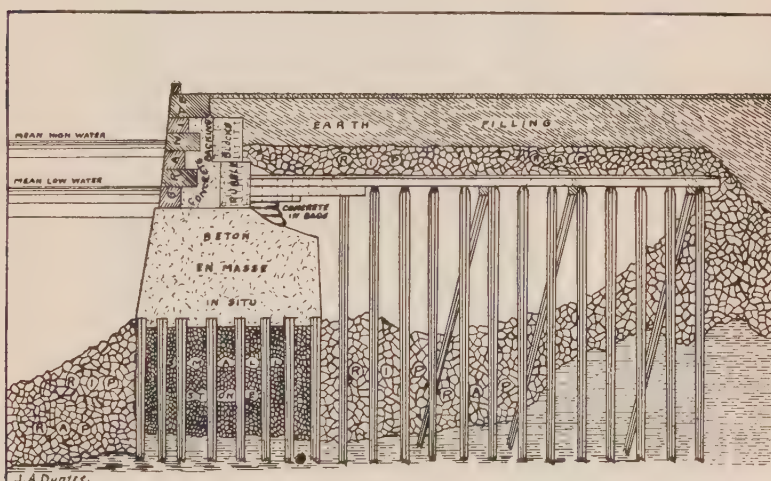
BULKHEAD WALL BUILT BEFORE 1876 AT CANAL STREET,
